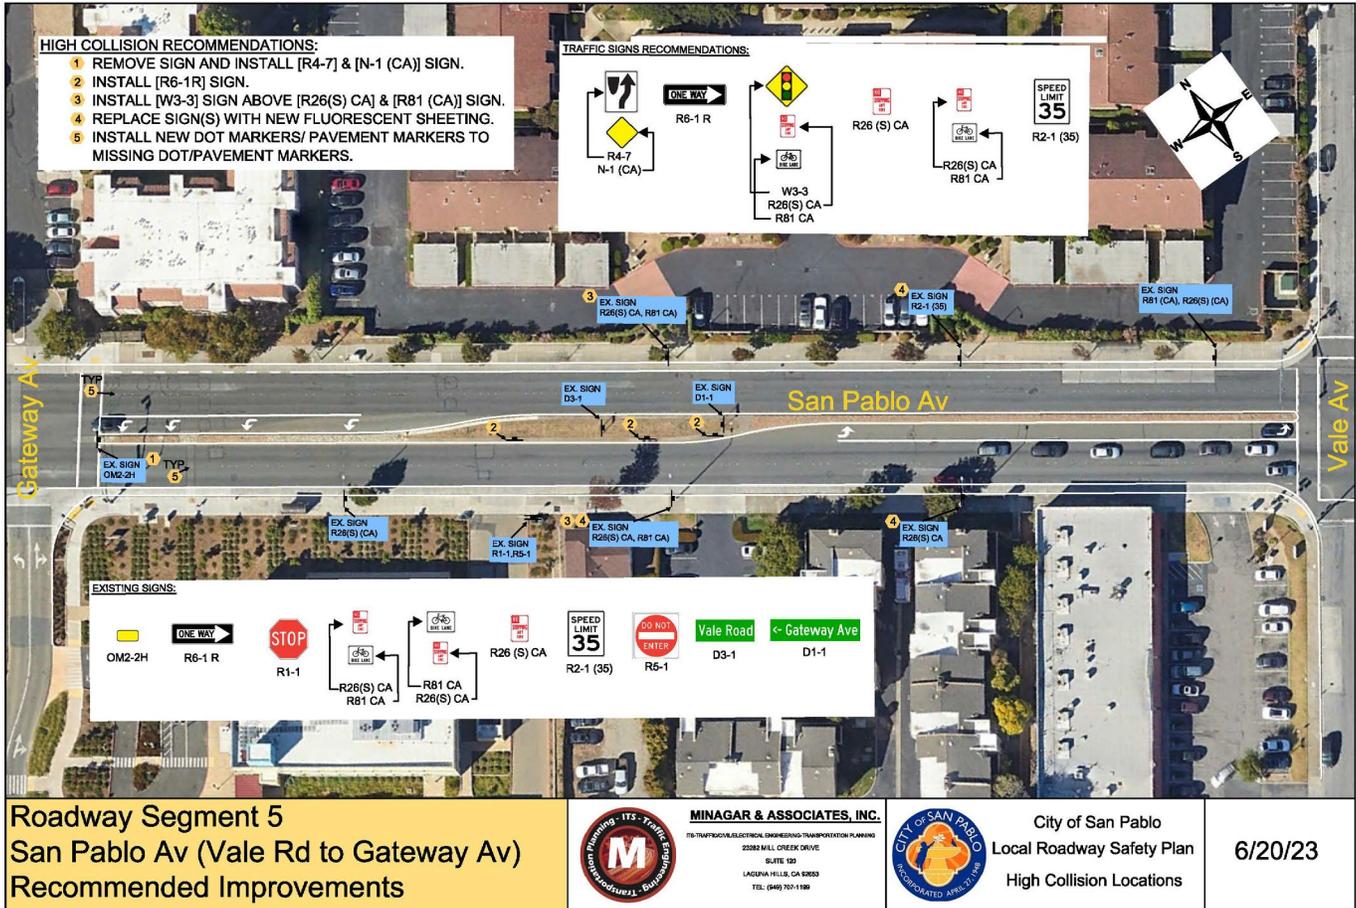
Roadway Segment 5- San Pablo Av (Vale Rd to Gateway Av) Recommended Improvements
